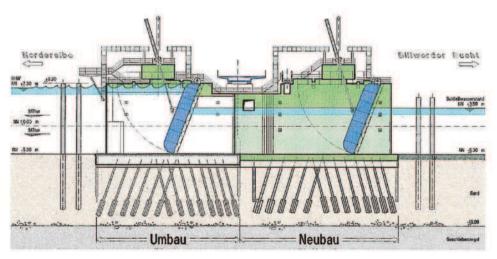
Cross-section of the Billwerder Bucht Barrier/© HPA Hamburg
